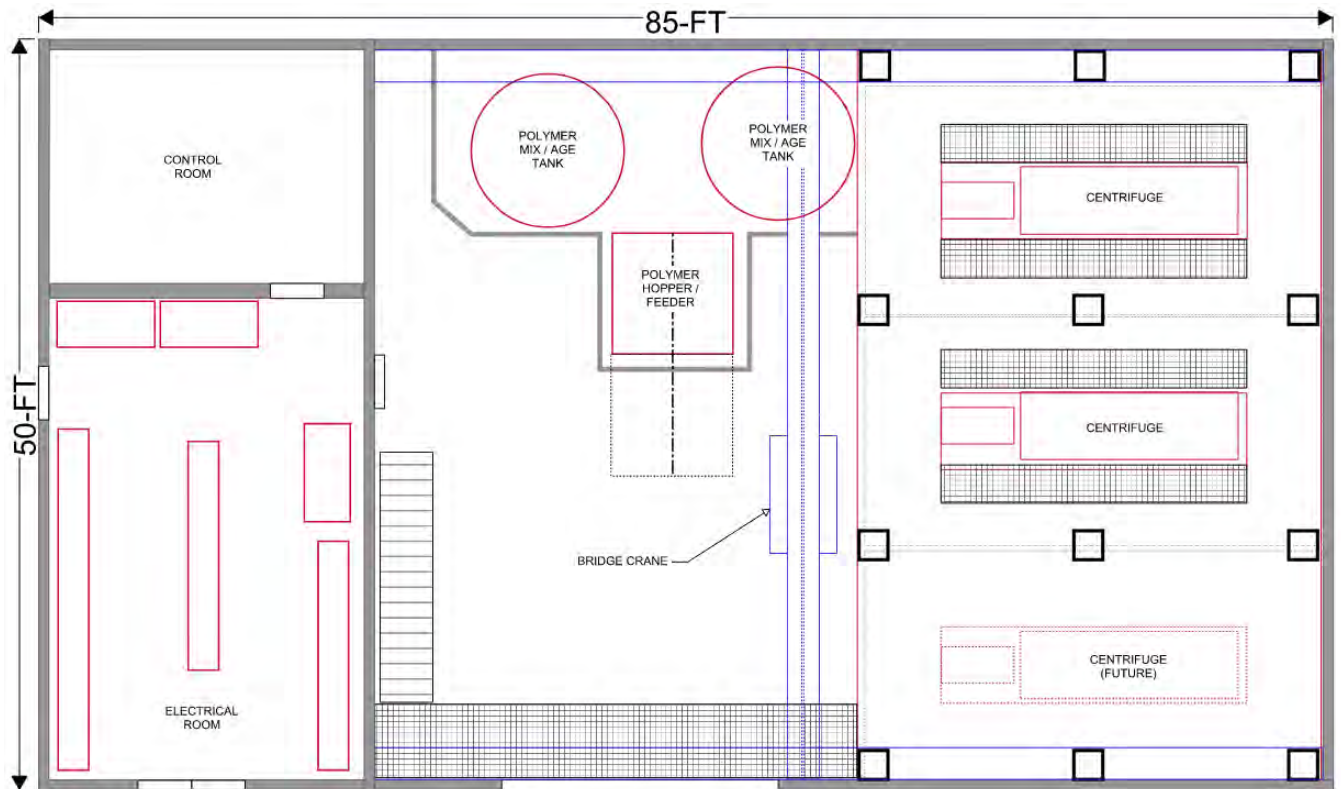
Alternative 5 Centrifuge Thickening Building Layout
